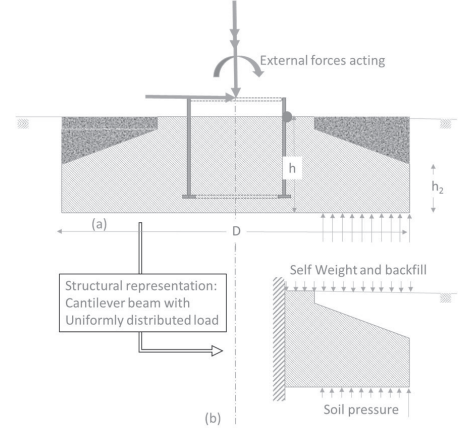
(a) geometry of foundation with external forces, (b) cantilever beam representative structure for (a).
